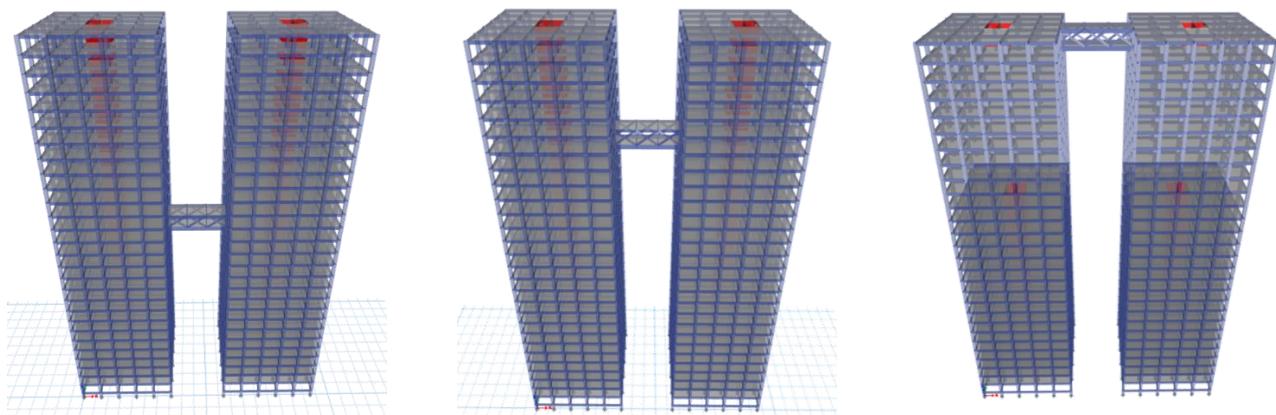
One sky bridge at a time on the 14th floor, 21st floor, 28th floor
